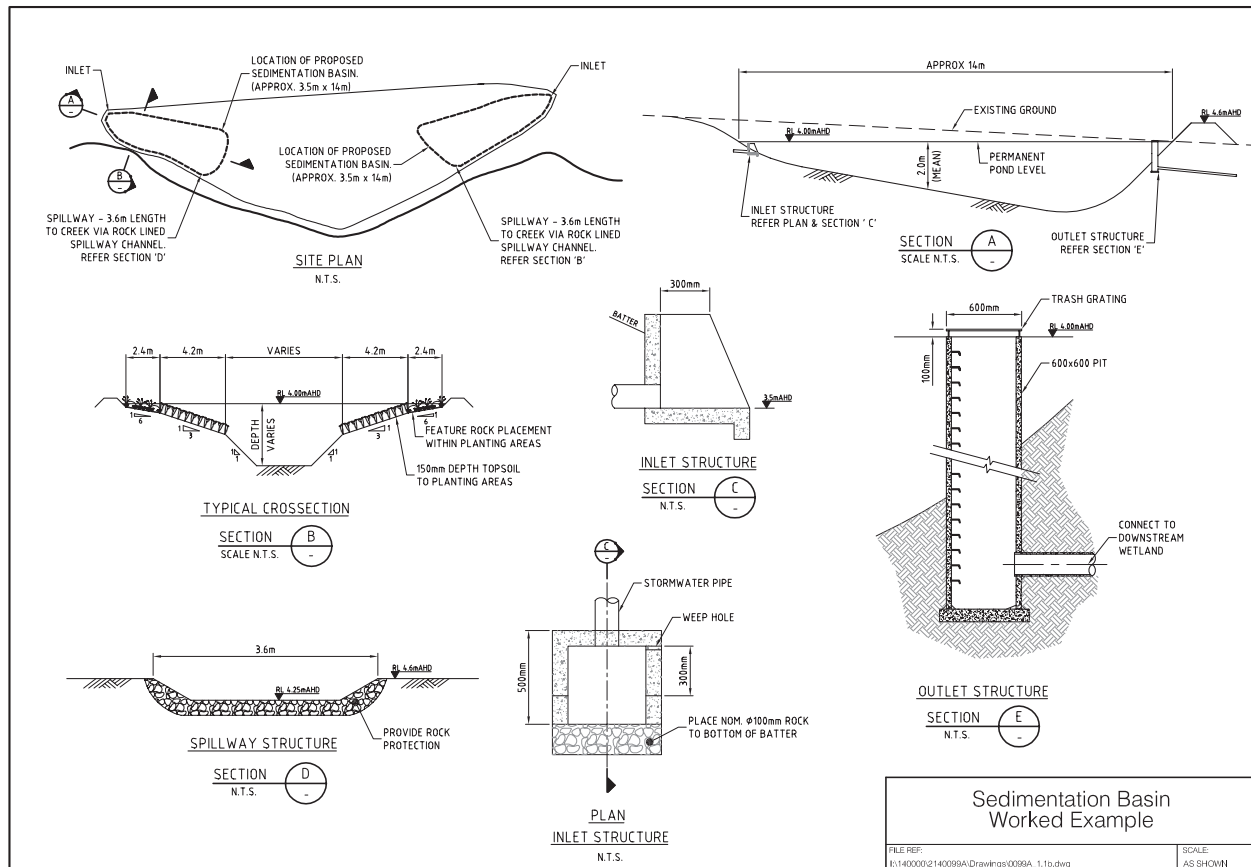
Construction drawing of the sedimentation basin worked example.
